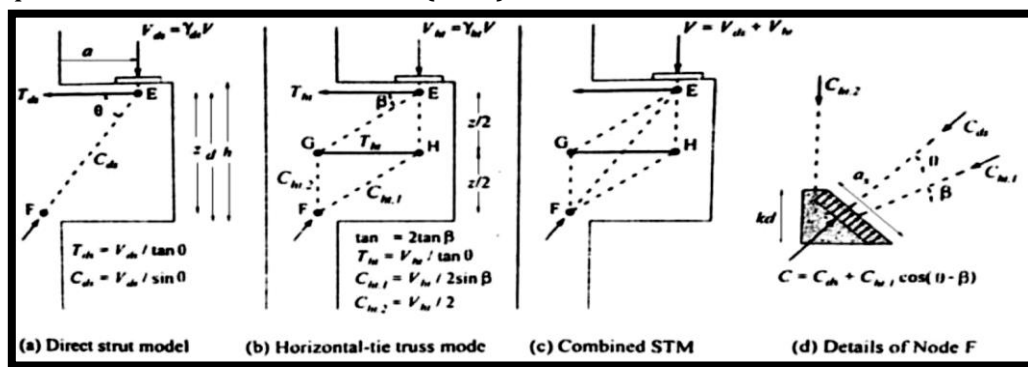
Strut-and-Tie Method for Concrete Corbel [19]
